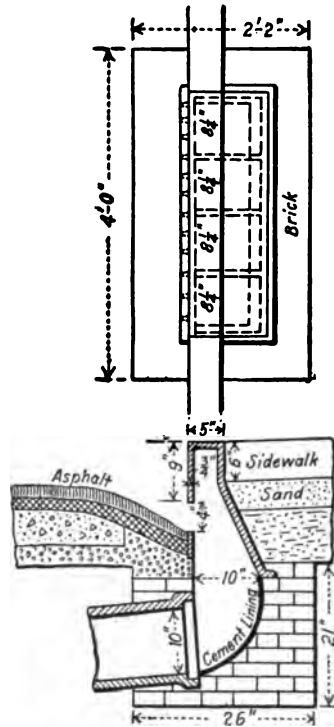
Details of an Untrapped Street Inlet, without Catch-Basin.
